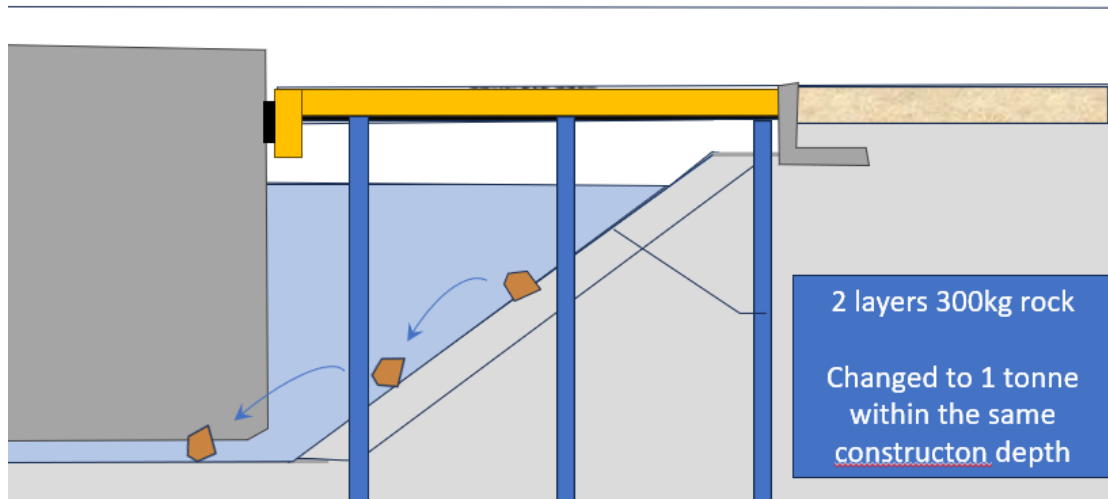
Schematic of suspended deck and underquay revetment with possible errant rock
